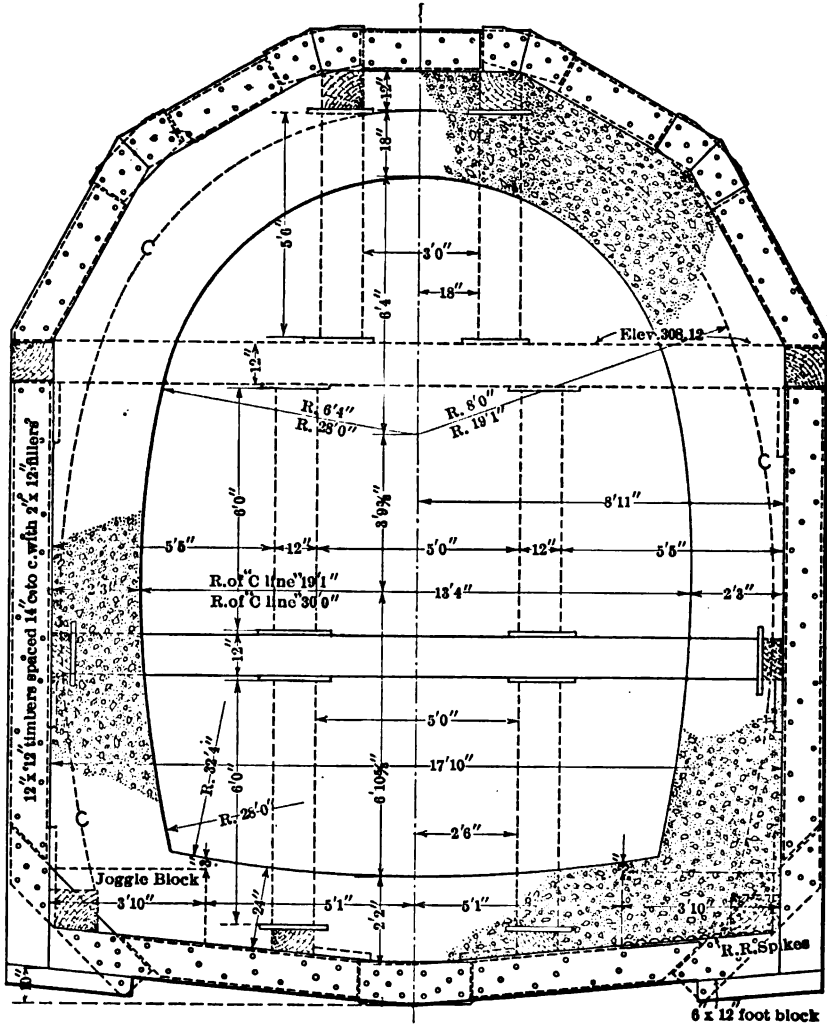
Eastview Tunnel Timbering in Heavy Ground and Concrete Lining. Used mostly for tunnel in compressed air,
